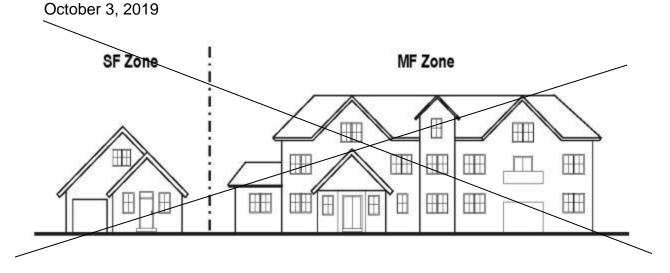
(C): Stepping repeating elements such as entry porches help large buildings fit better with adjacent single-family neighborhoods.
